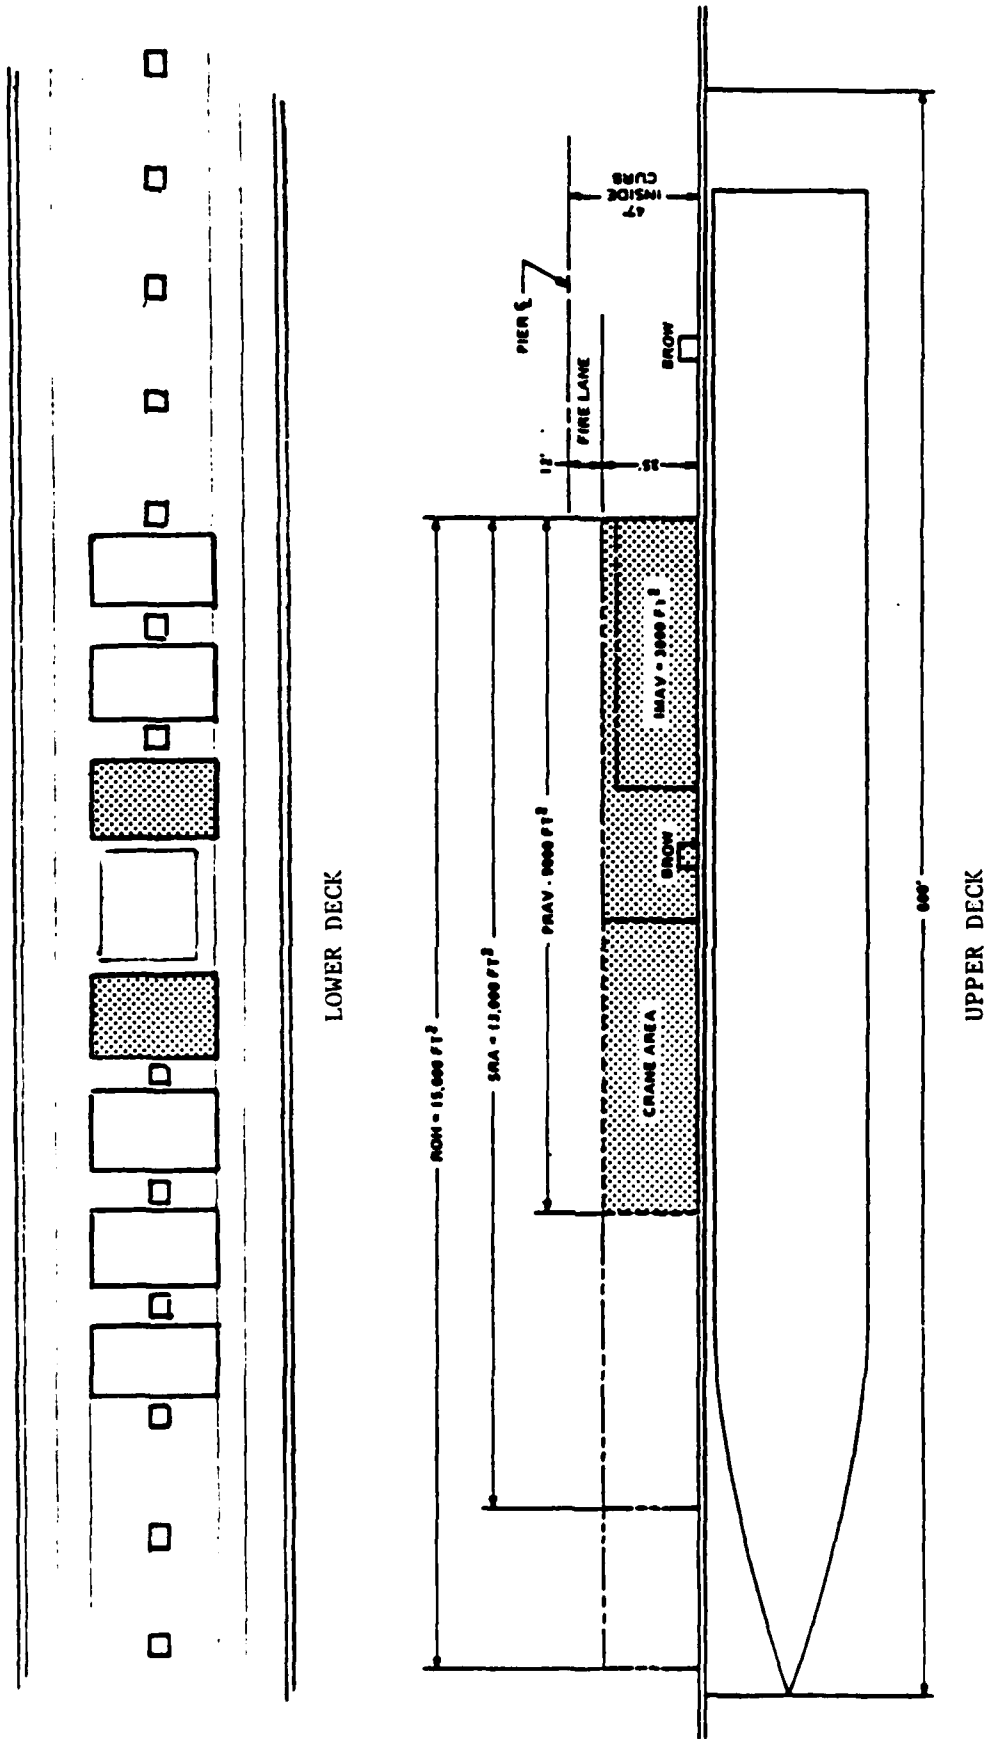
Space Requirements for PRAV - Double-Deck Pier.
